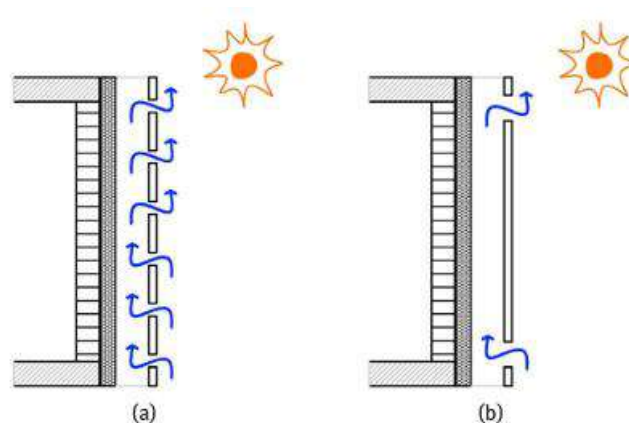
Types of ventilated facades: (a) open joint and (b) closed joint [14].
